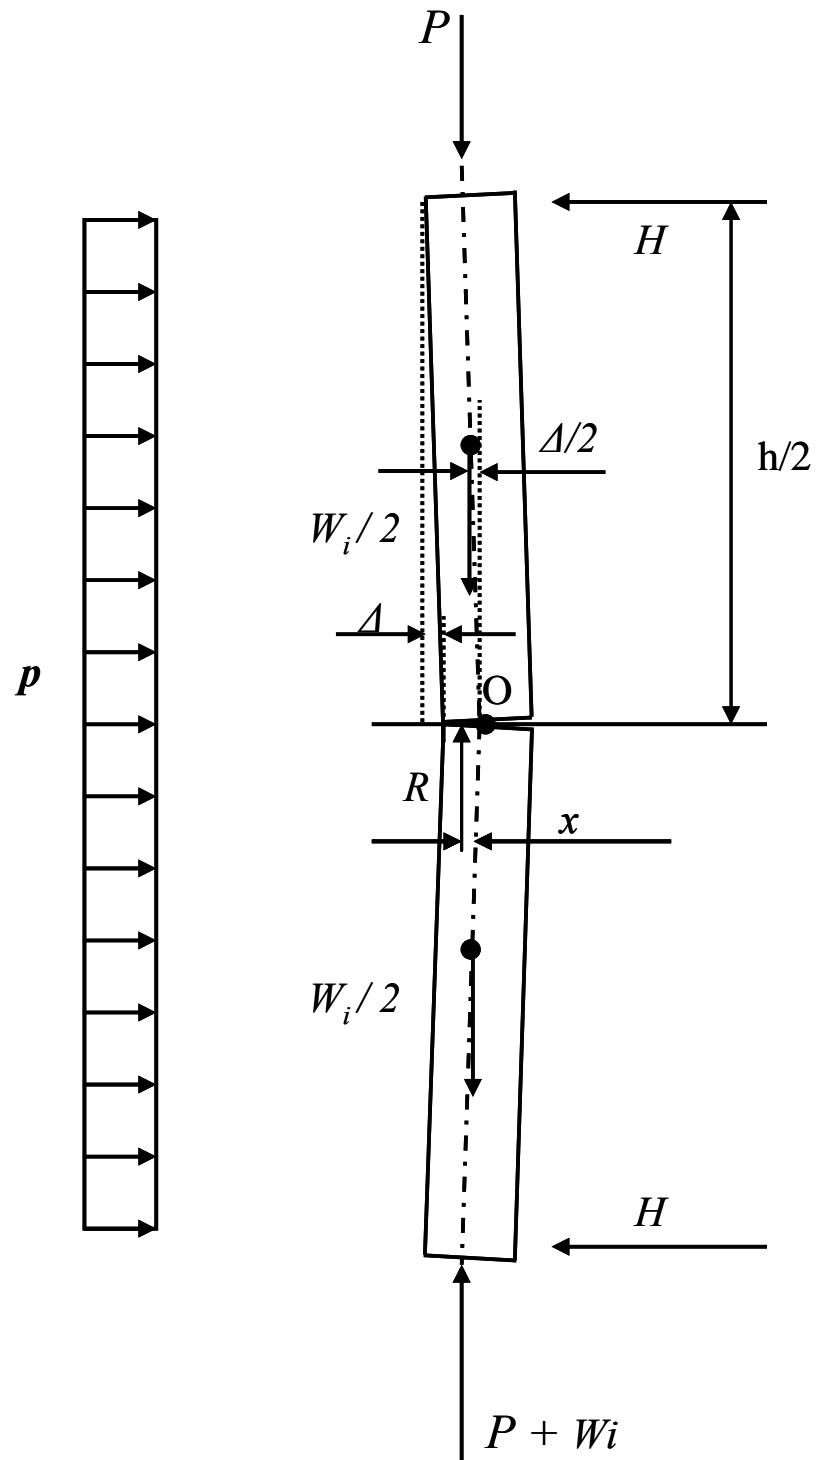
Moment equilibrium for face-loaded wall
